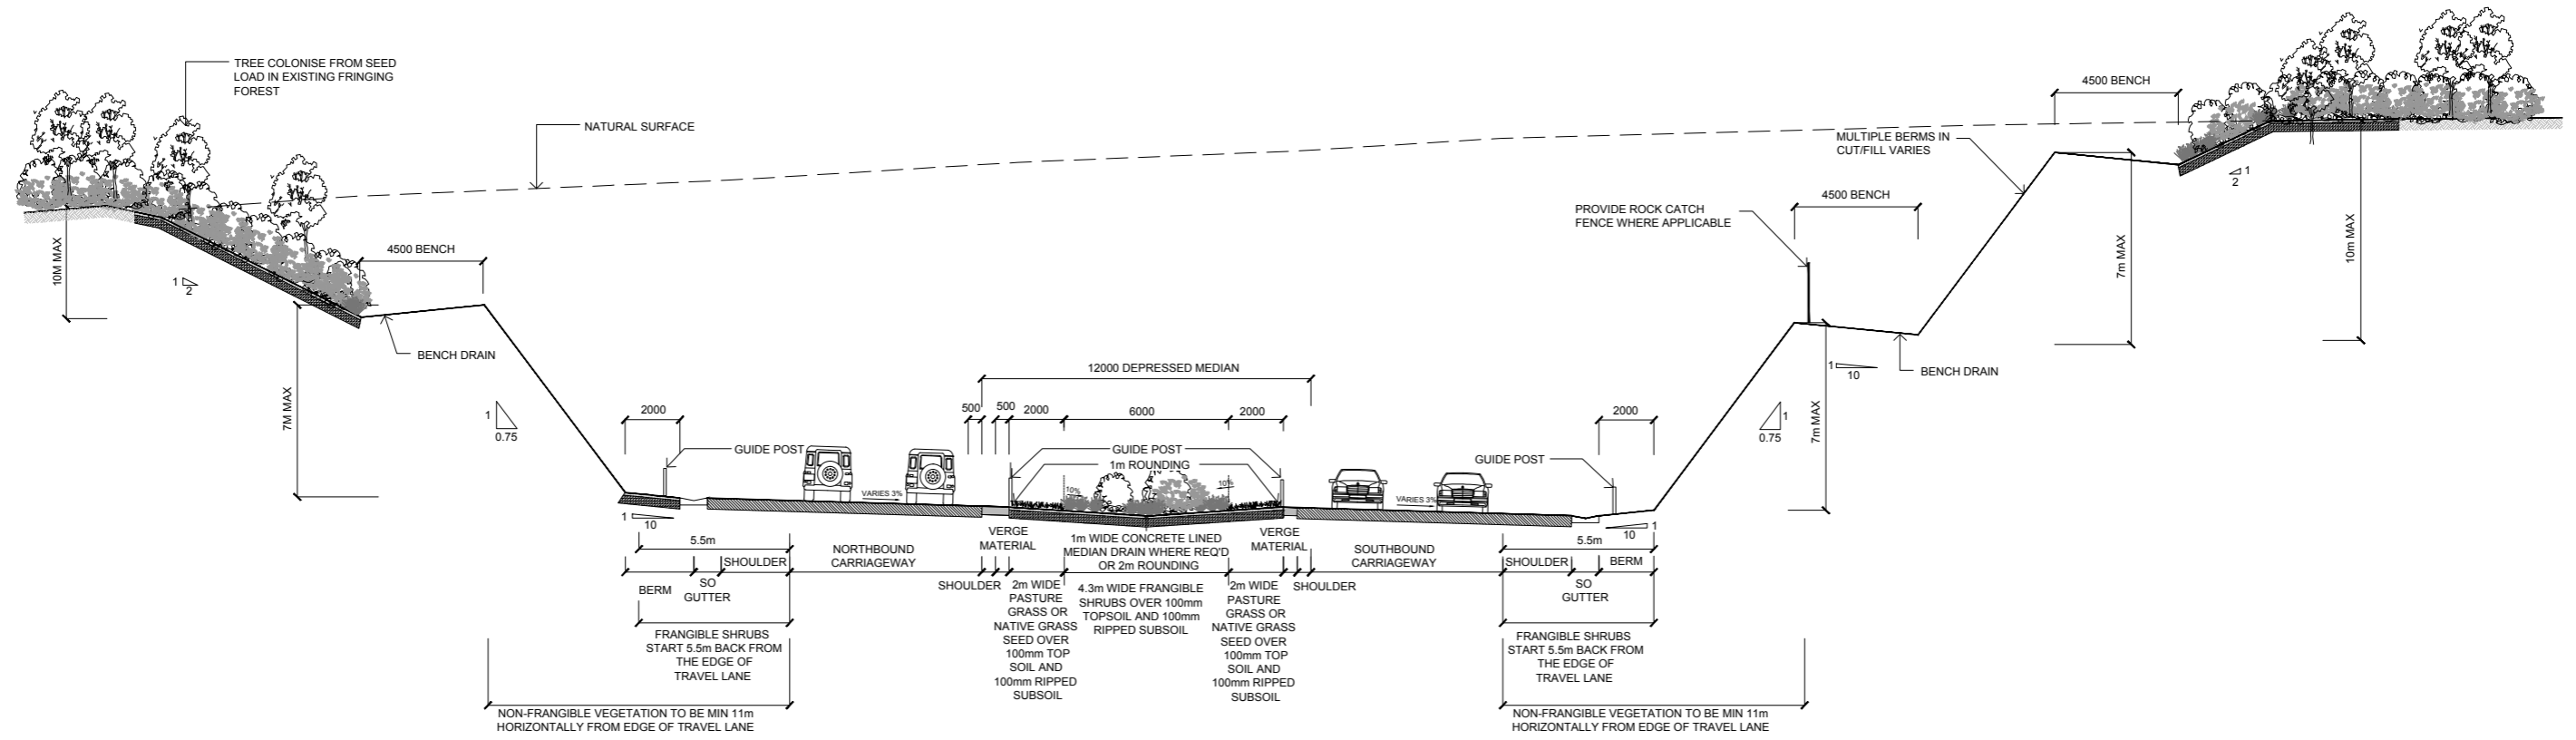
Typical Cross Section 9: Typical rock cutting with .75:1 to 2:1 batters - on superelevation
